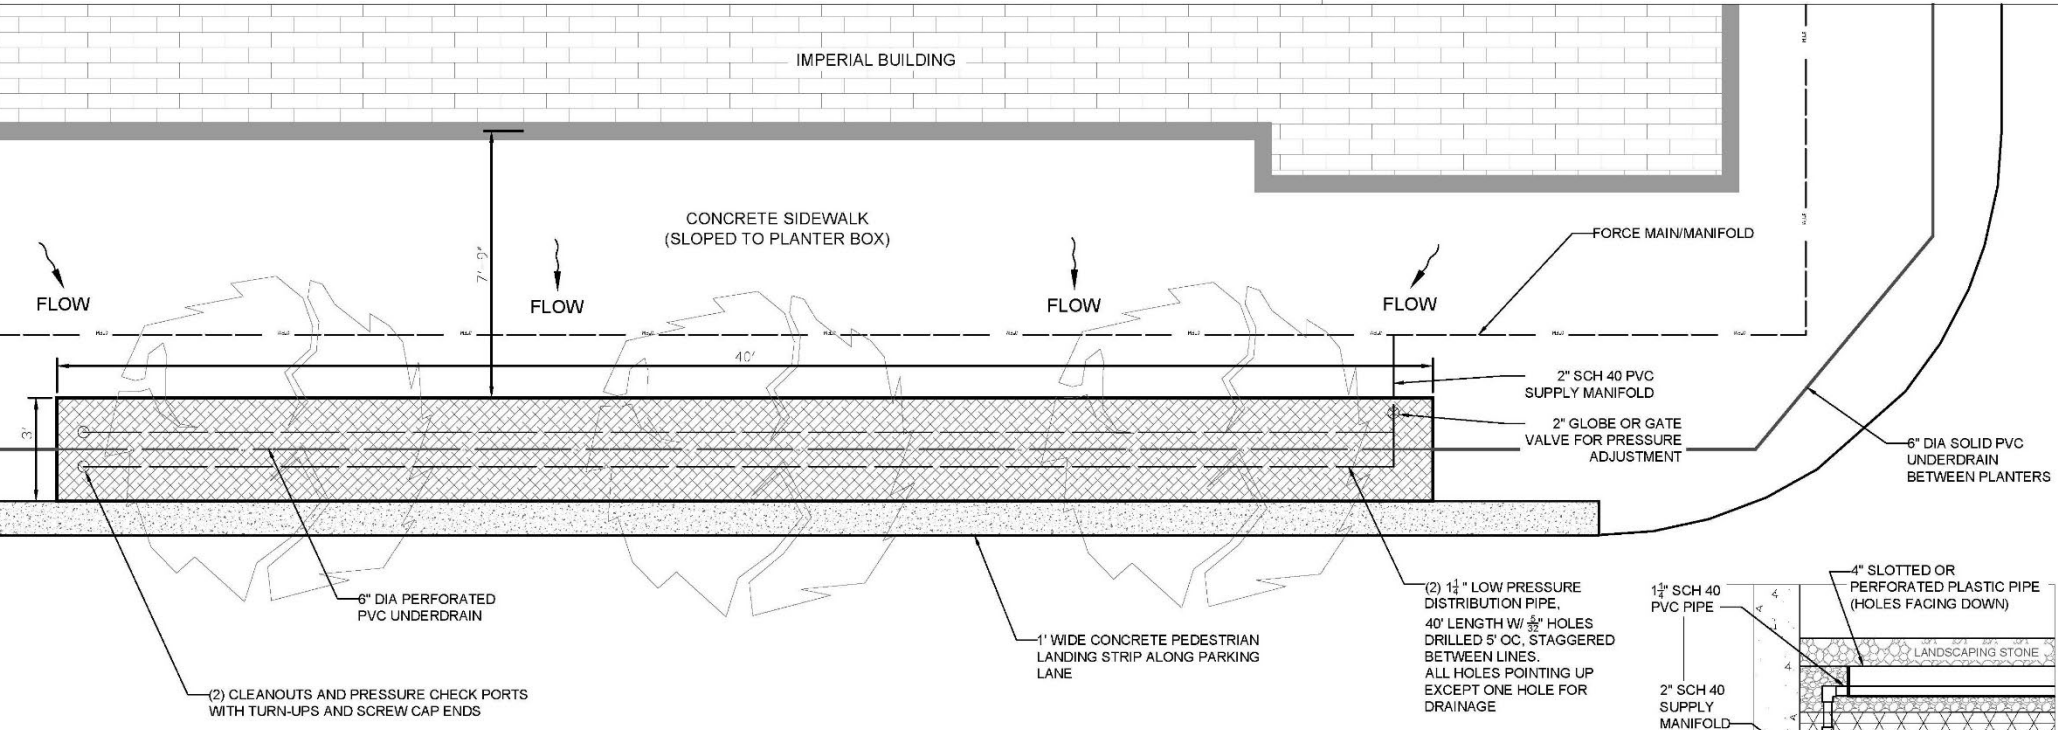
(SECTION A-A) PLANTER BOX SECTION
